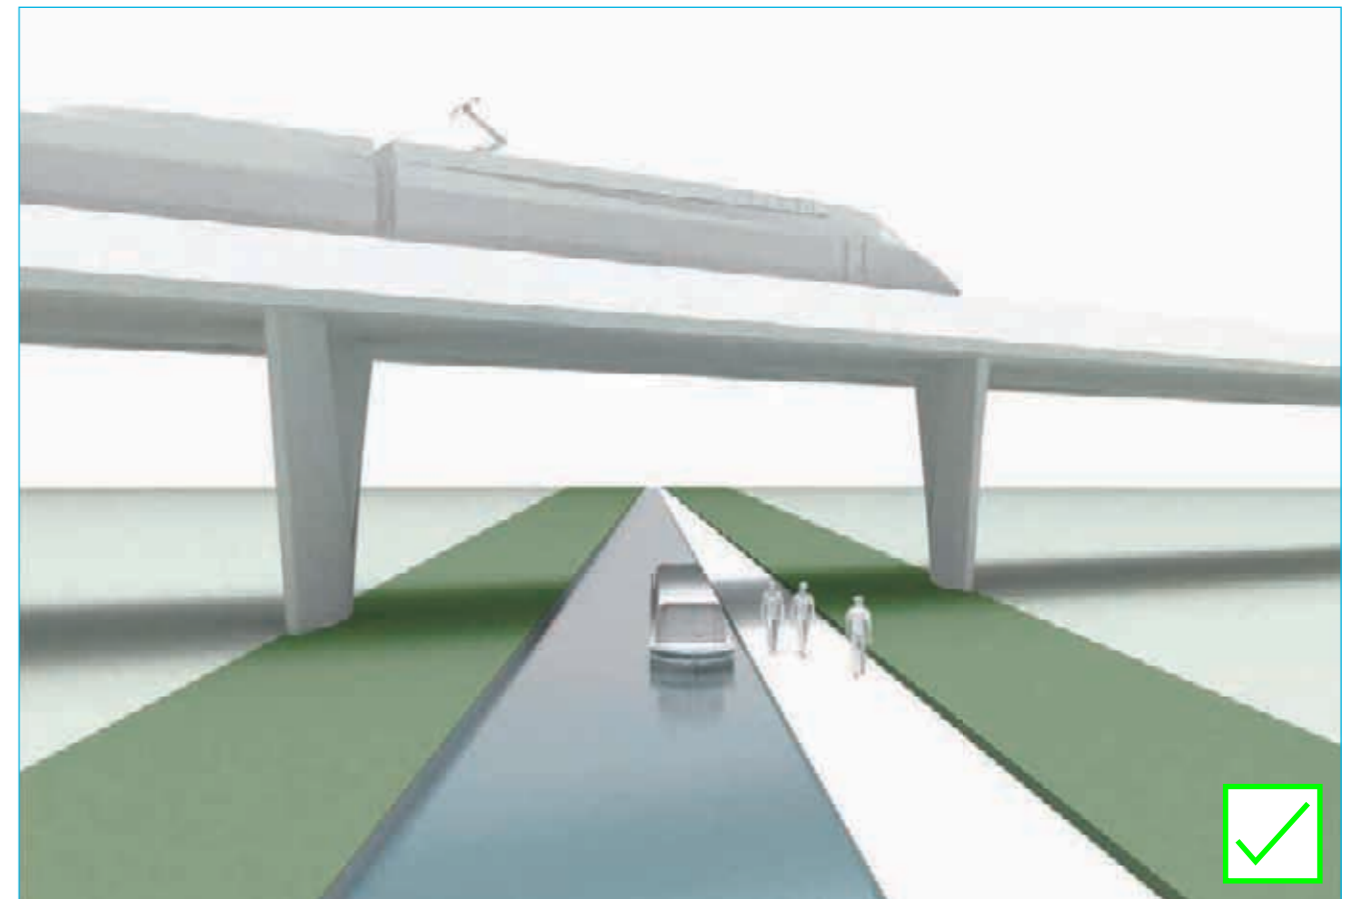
Piers aligned to the canal do not create 'dead' spaces for skewed crossings
